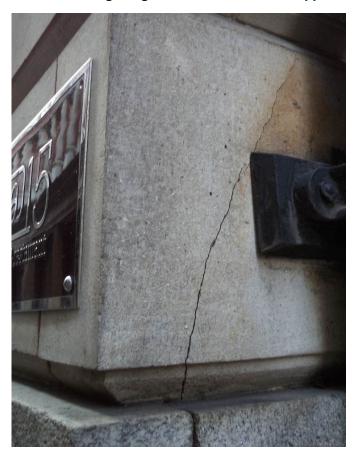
Detail of existing vertical cracks to the right hand side of the entrance foyer
